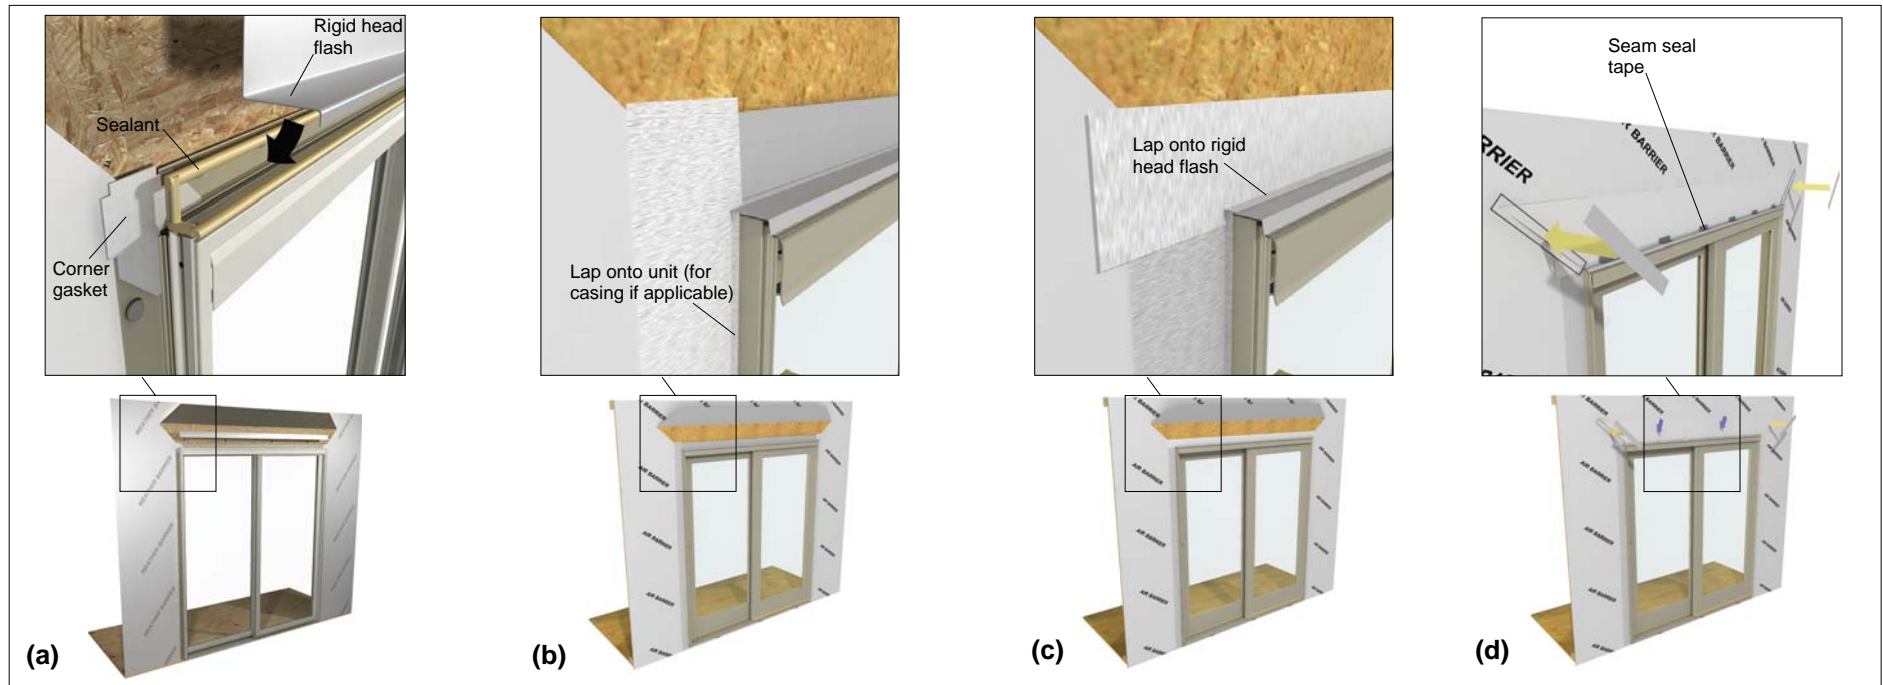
Flashing the installation. (Sliding door shown but applies to swinging door as well.)
